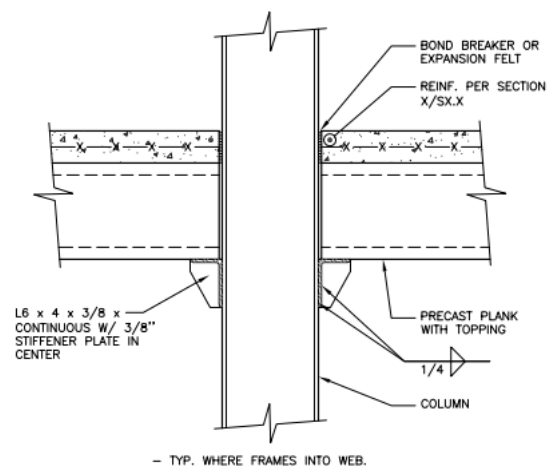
Precast Plank Support at Steel Column (S12.20 Drawing 8)
